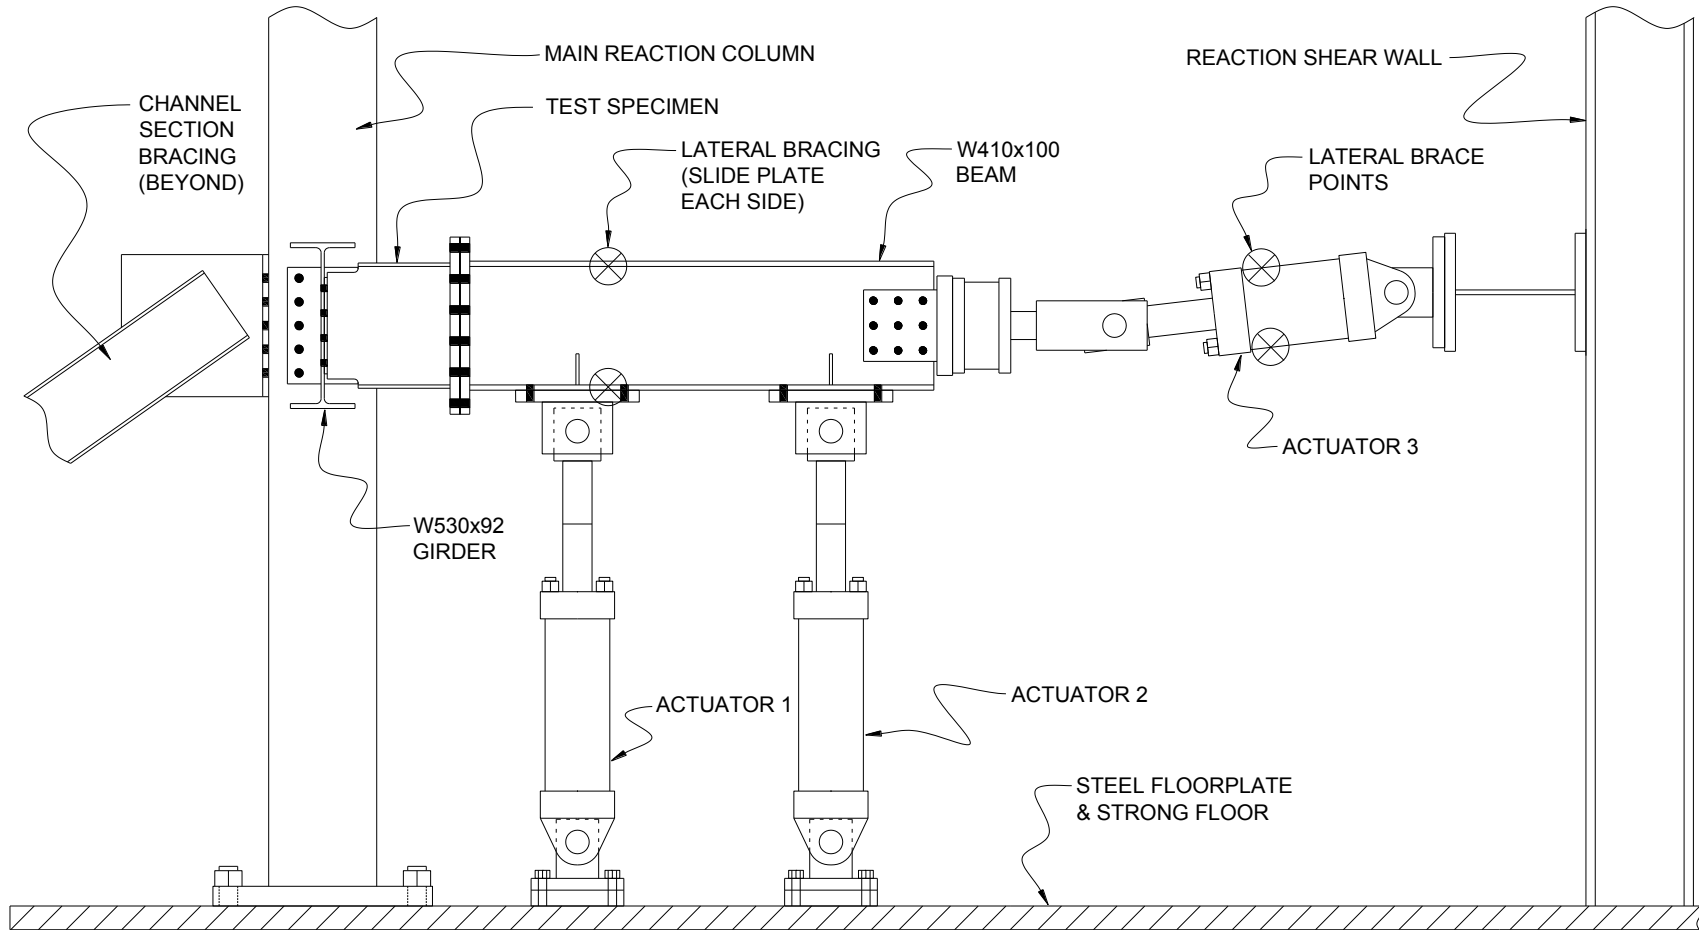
Test set-up for end-support A in elevation (D similar)
